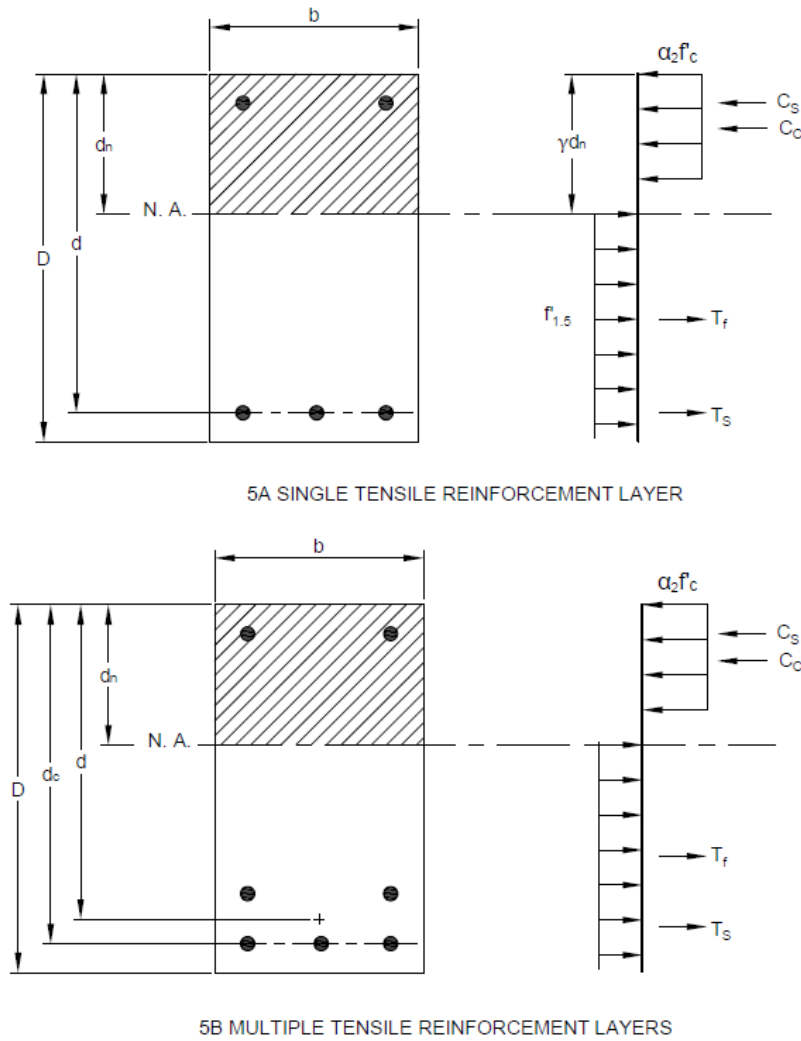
STRESS BLOCKS AND FORCES ON REINFORCED SFRC SECTION
